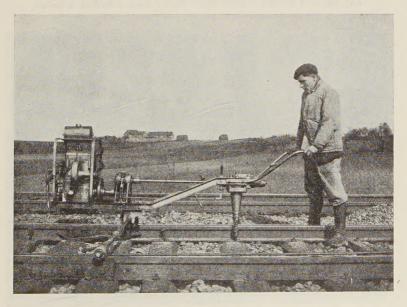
« Jami » wood screw driver, with « Jap » motor.
